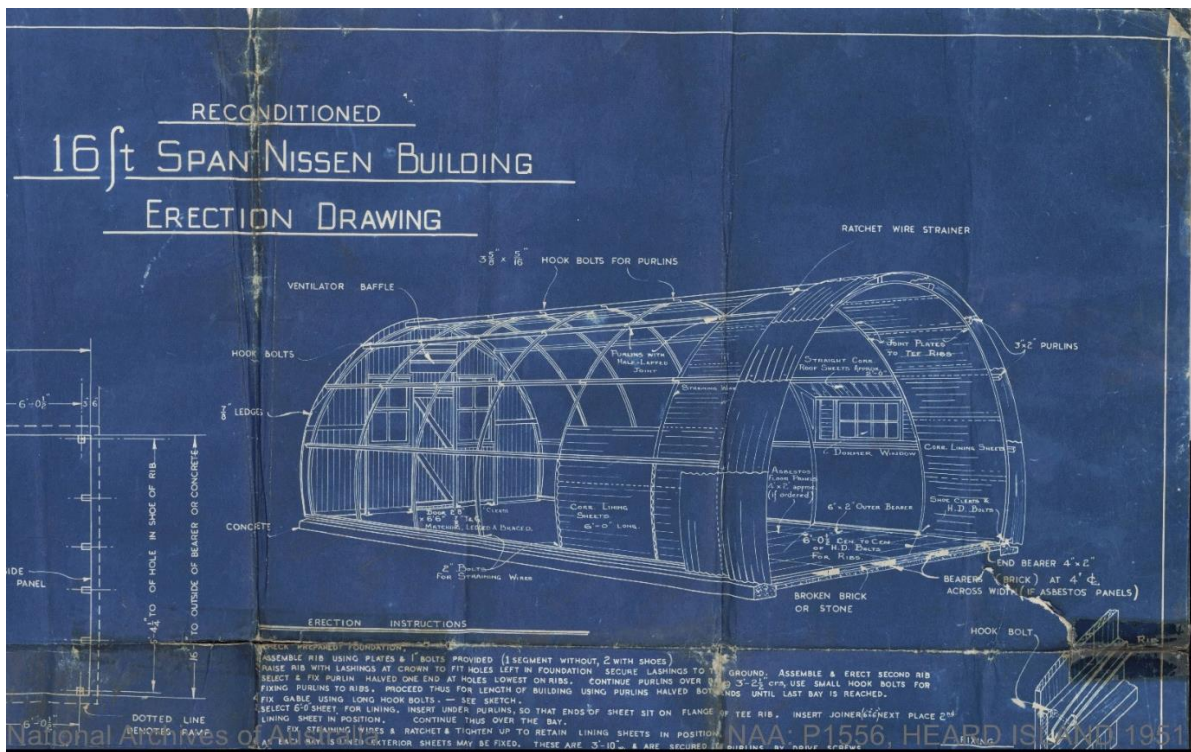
Reconditioned 16ft Nissen Building Erection Drawing, showing instructions for installation
